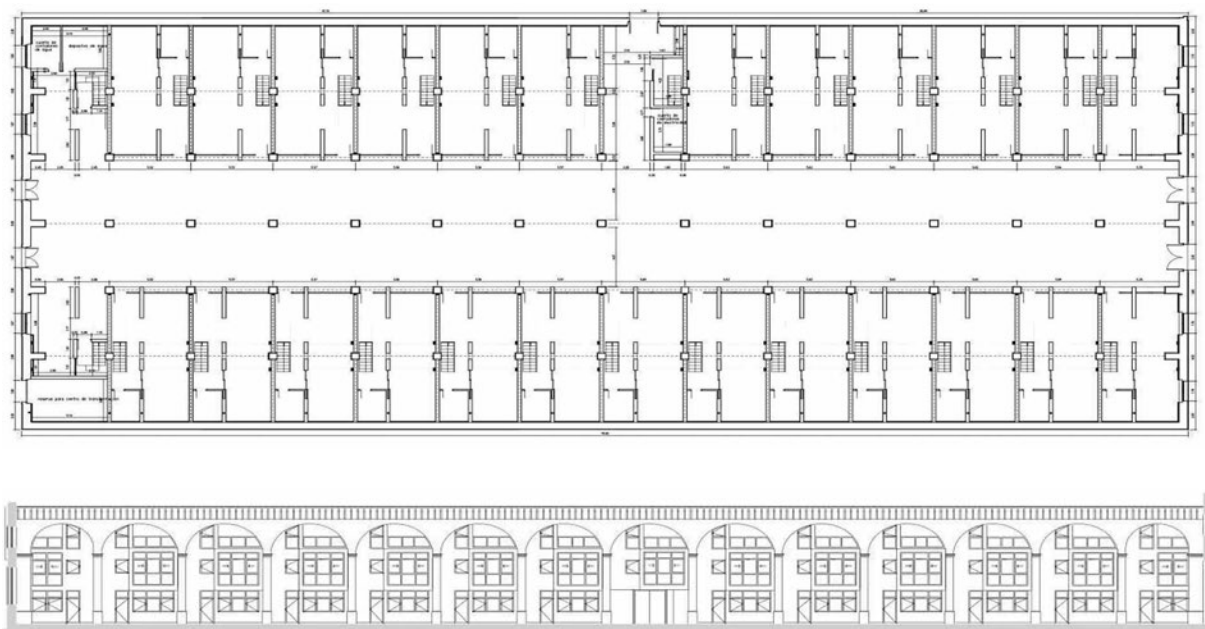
Floor plan and longitudinal section of the converted bodega on 2, Lechugas st (Sánchez, 2014, 52)
